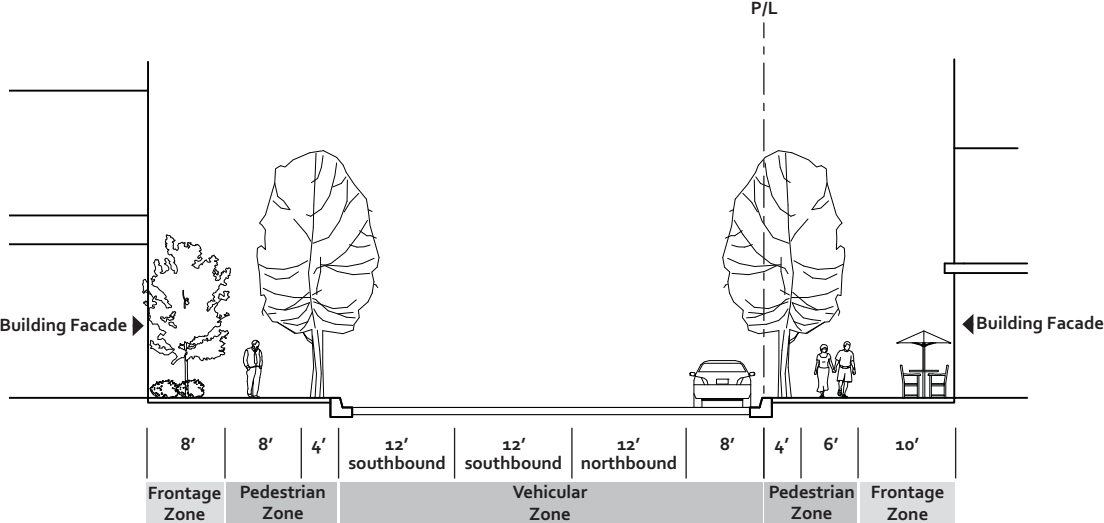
Asian Garden Mall Drive North (without Parking) Section
